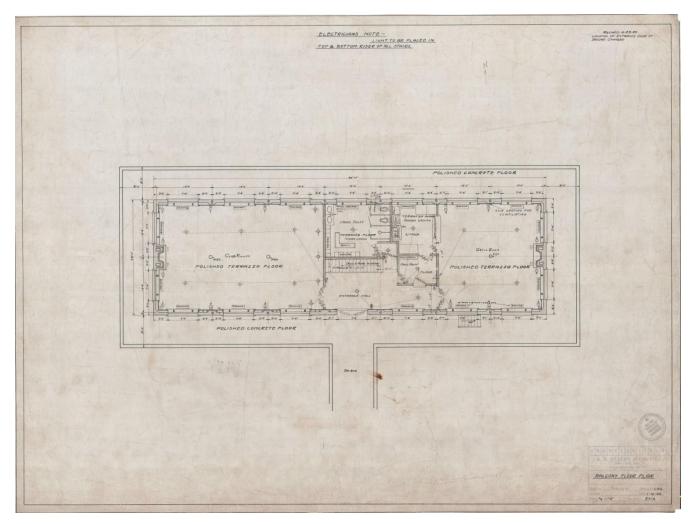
Balcony Floor Plan* (AES, Drawing No. 5312, 10 January 1920). As originally designed, this level had the Club Room, Grill Room, Entrance Hall, Check Room, Kitchen, and Ladies Toilet. The men's toilet was located on the Pump-Floor Level below. This is a revised floor plan, with changes having been made to the main entrance doorway in early January. Both the interior and exterior stairs were subsequently modified, and not constructed as illustrated here. Similarly, it is suspected that the interior stairs to the Pump Level were not constructed as shown here either.
